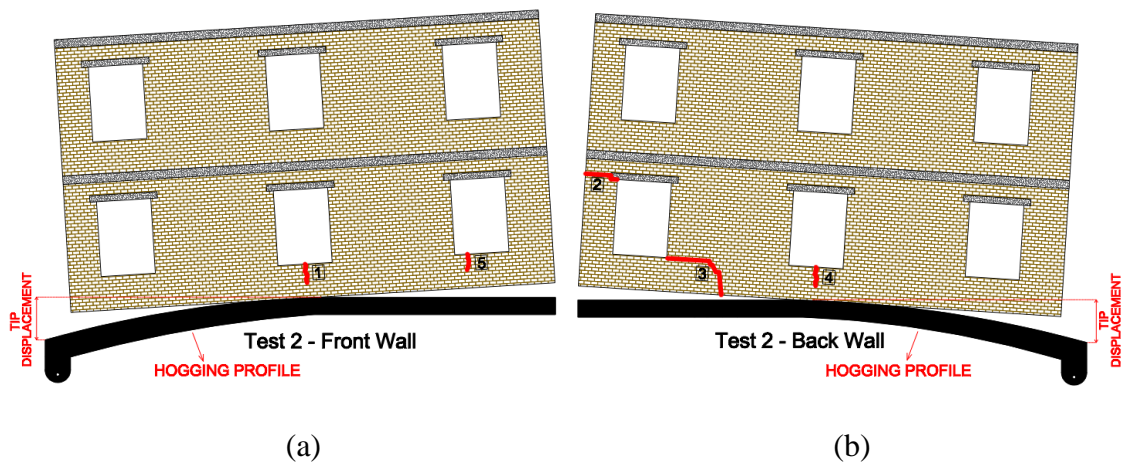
Schematic views of walls and cracks after Test 2: (a) front wall of the reference specimen, (b) back wall of the reference specimen.
